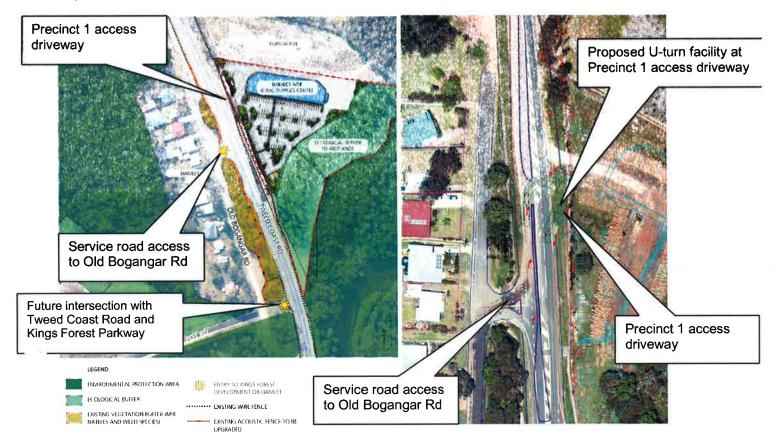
Access arrangements for Precinct 1 and Old Bogangar Road
